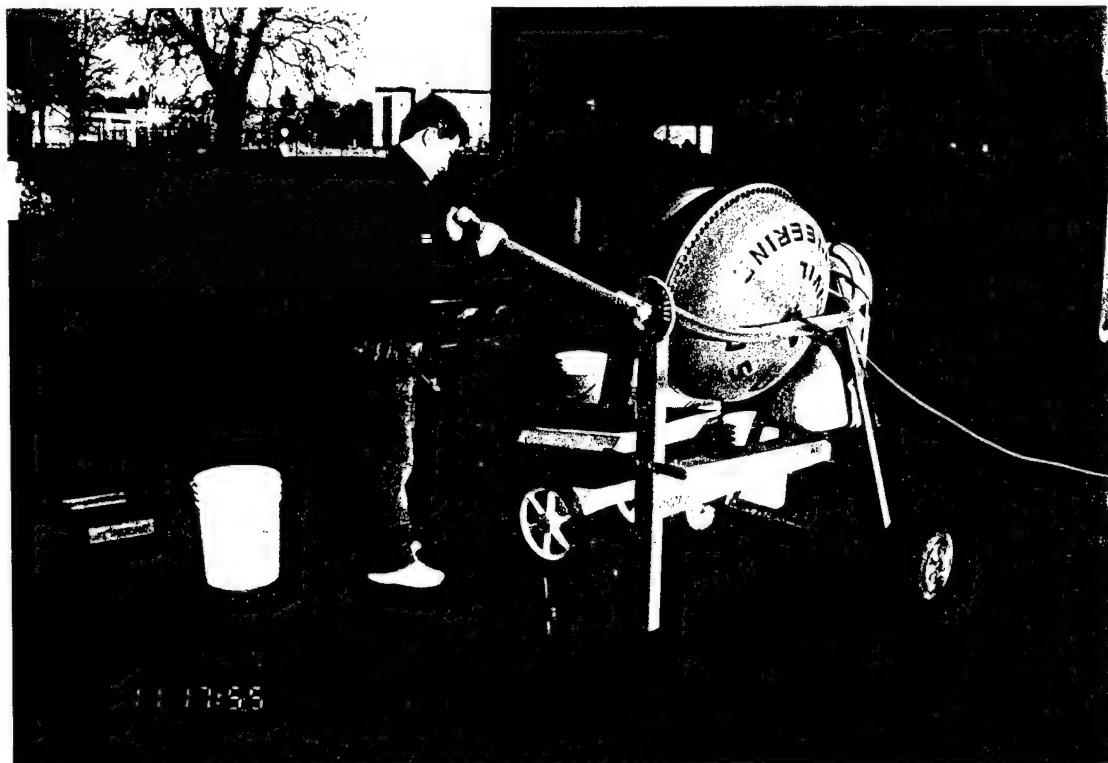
Mixing and Washing of Ballast Stone Prior to Building Model
